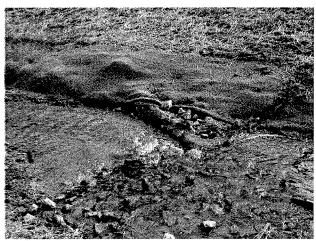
Looking downstream from LT Station 12+10 at root wads installed between MC Stations 12+45 and 12+65. (9/27/04)
